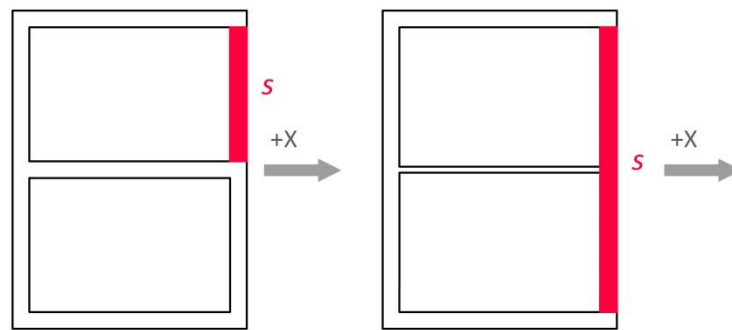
Intermediate walls should be only considered as earthquake resistant walls when they present enough dimensions to fulfill this function (plan view)
